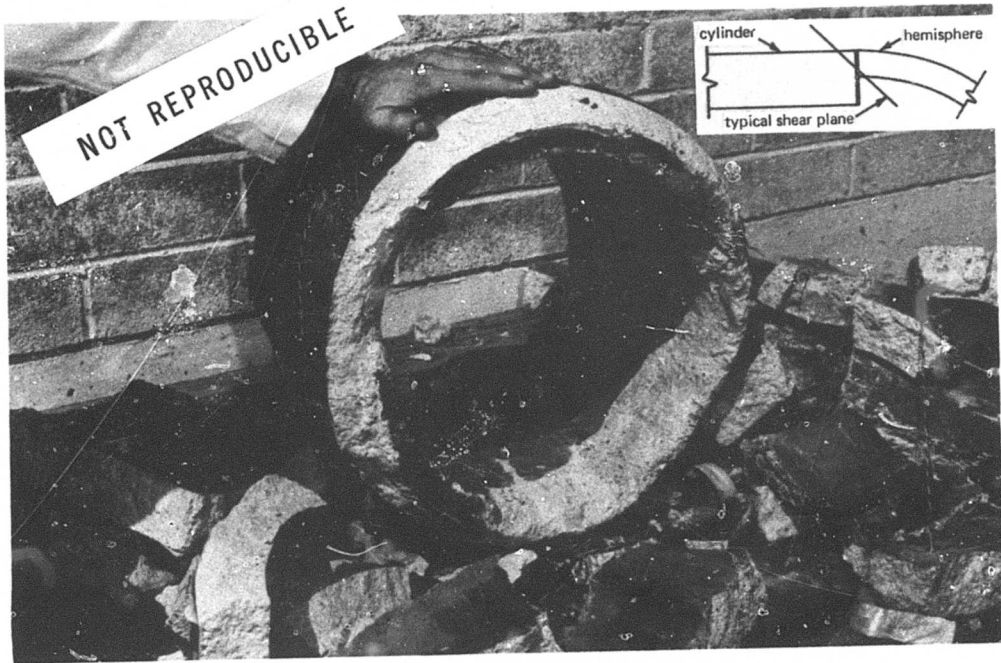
Bearing shear failure at cylinder edge for specimen 1.
